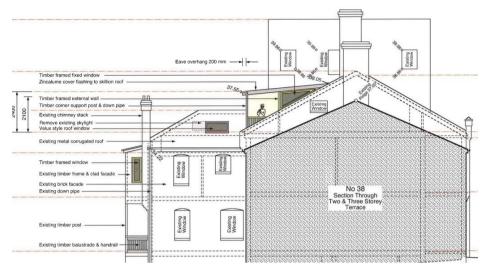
Approved Dormer Elevation (adjoining property) DA392/2012
